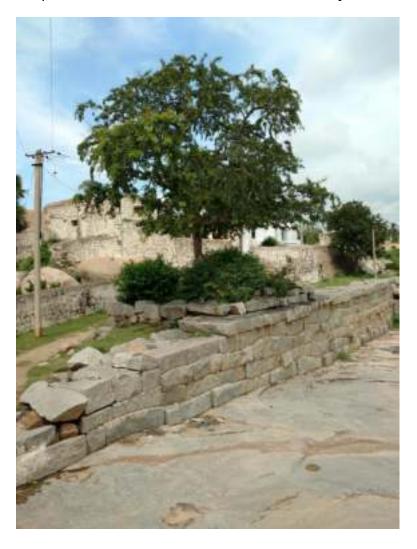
River front facade of the fort wall - the facade is in a good condition - minimal restoration required.
